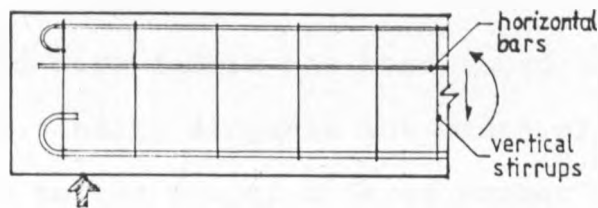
ORTHOGONAL REINFORCEMENT
